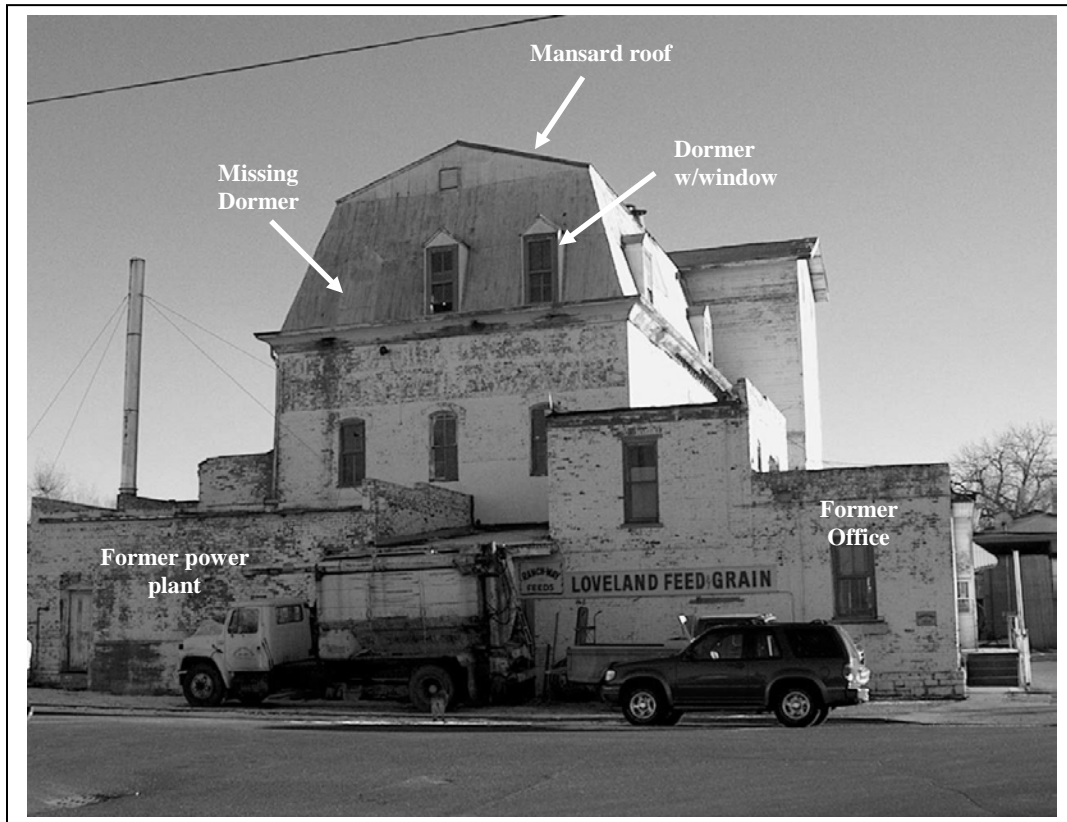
North façade features main brick structure with dominant mansard roof.
